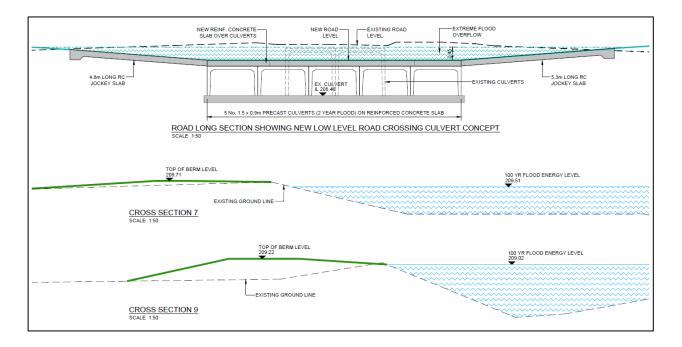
Cross-sections of the proposed new road crossing and berms on the left-hand bank of Stream 10.
